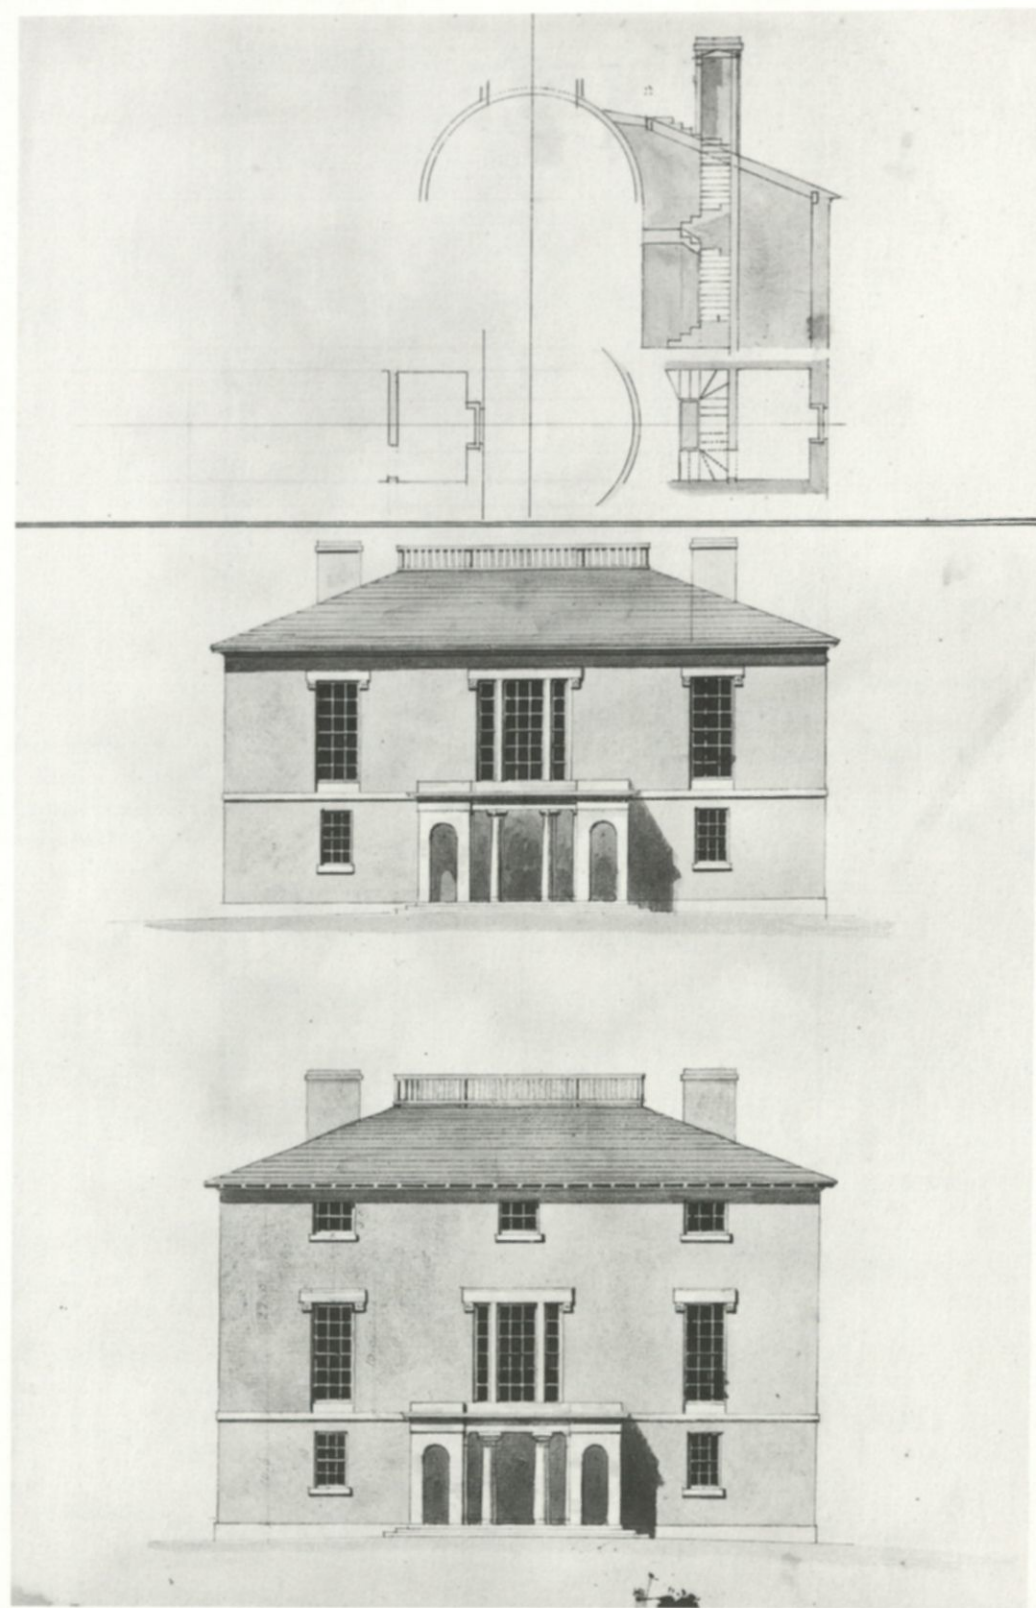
Latrobe elevations and partial plan / section for Pope Villa, undated but ca. 1811. (Library of Congress, Division of Prints and Photographs)
